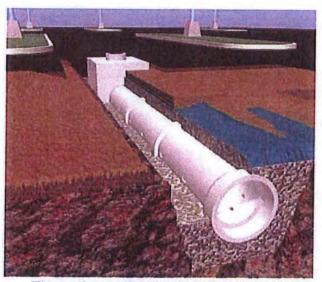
Exfiltration Pipe at Inlet (Picture provided by Oldcastle Precast)
